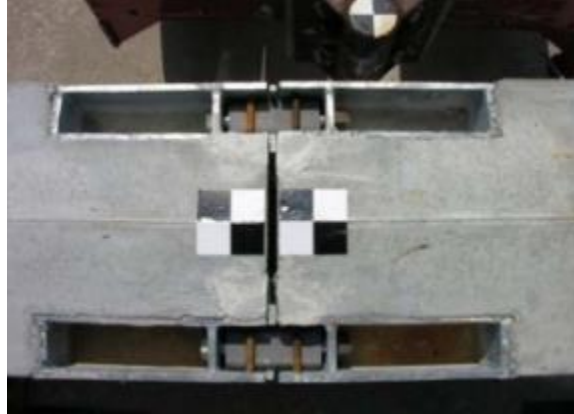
A plan view of MWRSF I-shaped rail connection
